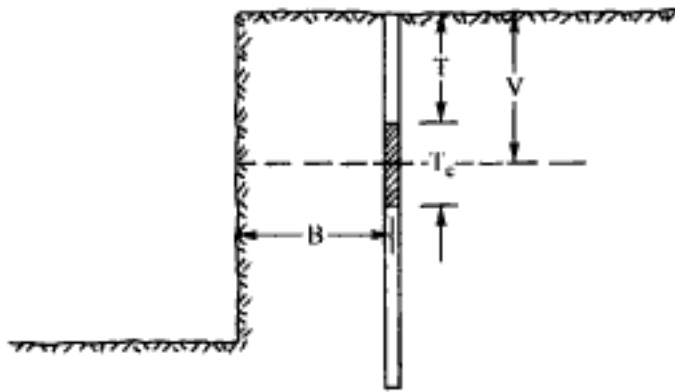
Section view showing a short cylindrical charge located at the hole collar.
